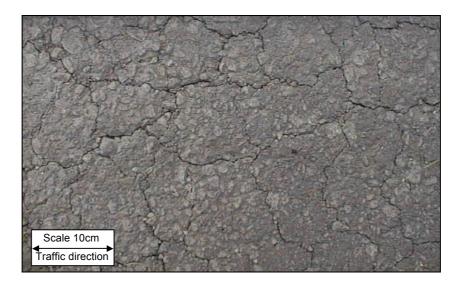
Final crocodile crack pattern observed at 'failure' of road section.
